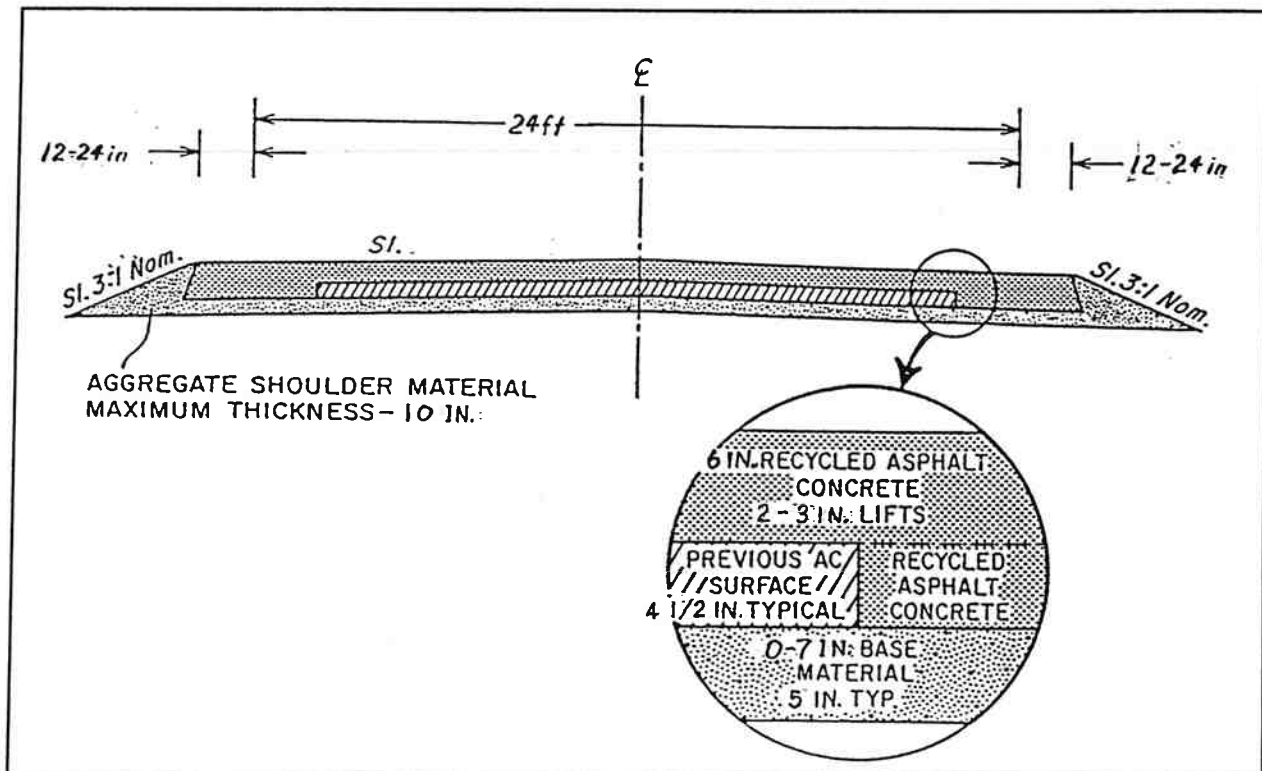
Recommended Typical Roadway Cross-Section Designs
